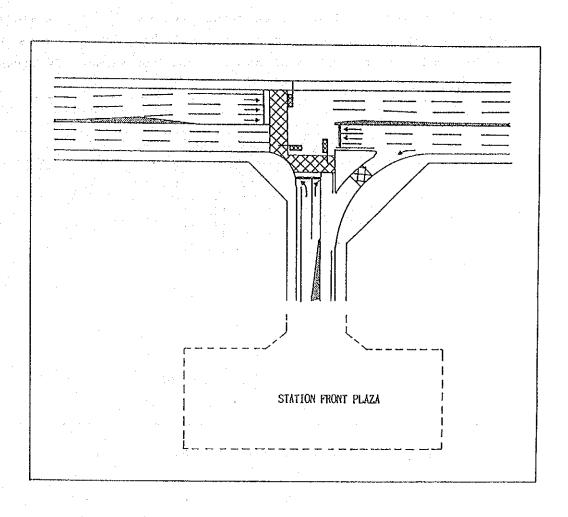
Proposed Traffic Control System and Access Road
